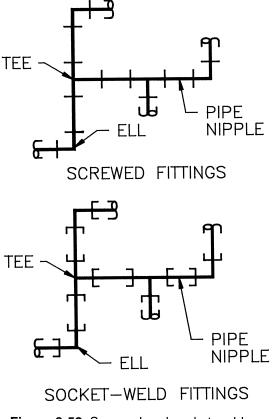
Screwed and socket-weld drawing symbols.
